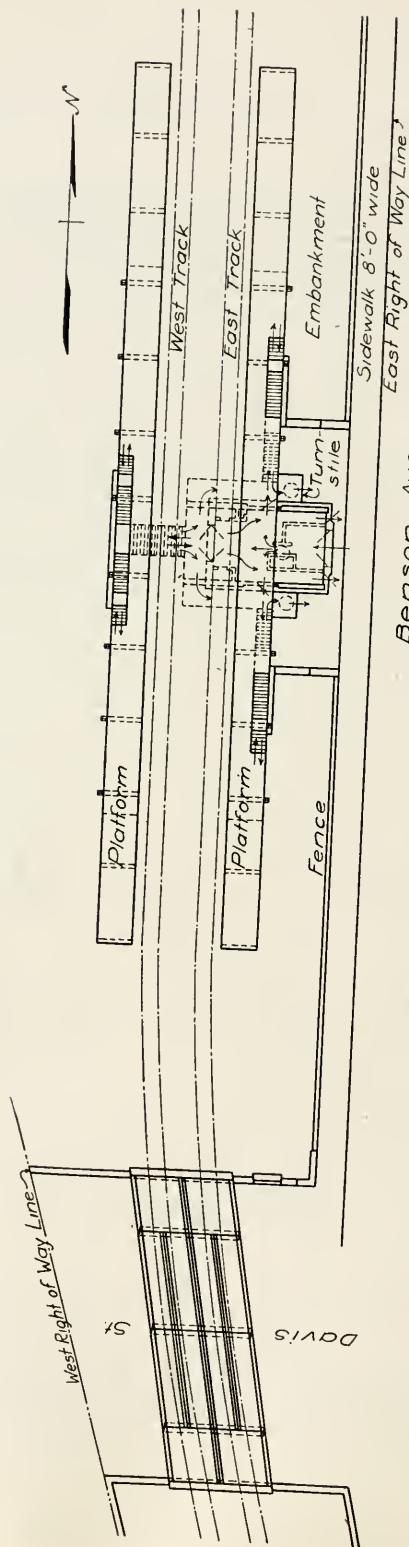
GENERAL PLAN OF DAVIS STREET STATION.
